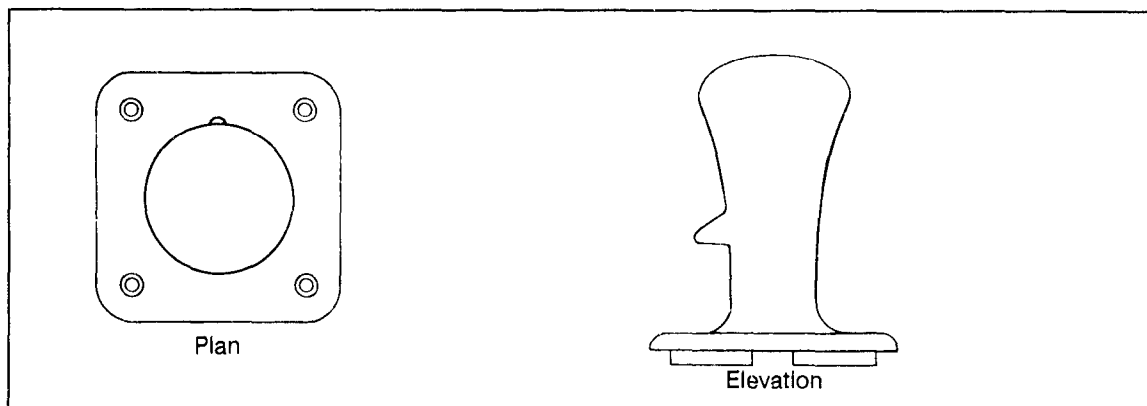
Plan and Elevation Views of a Corner Mooring Post
